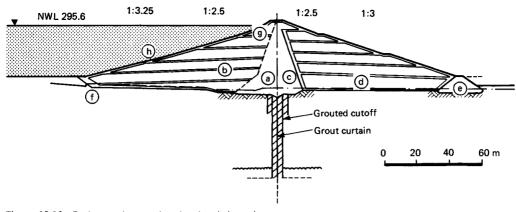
Backwater dam: section showing drainage layers. (a) Glacial till core; (b) glacial till shoulder; (c) chimney drain; (d) drainage layers; (e) rubble toe; (f) spoil; (g) concrete block; (h) riprap
